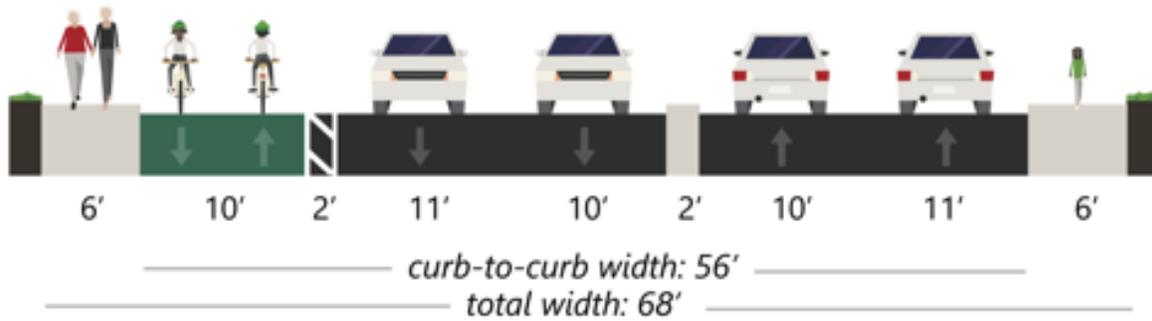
ALTERNATIVE CROSS SECTIONS – EAST: I-5 OVERPASS TO STEPHENS STREET
